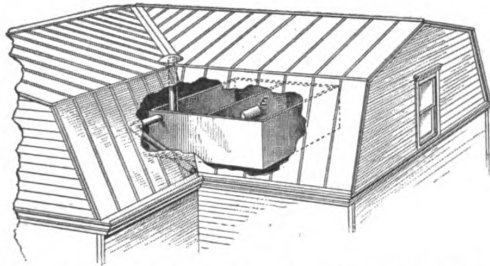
Broken View, Showing Valley, Inlet and Outlet Pipes.
